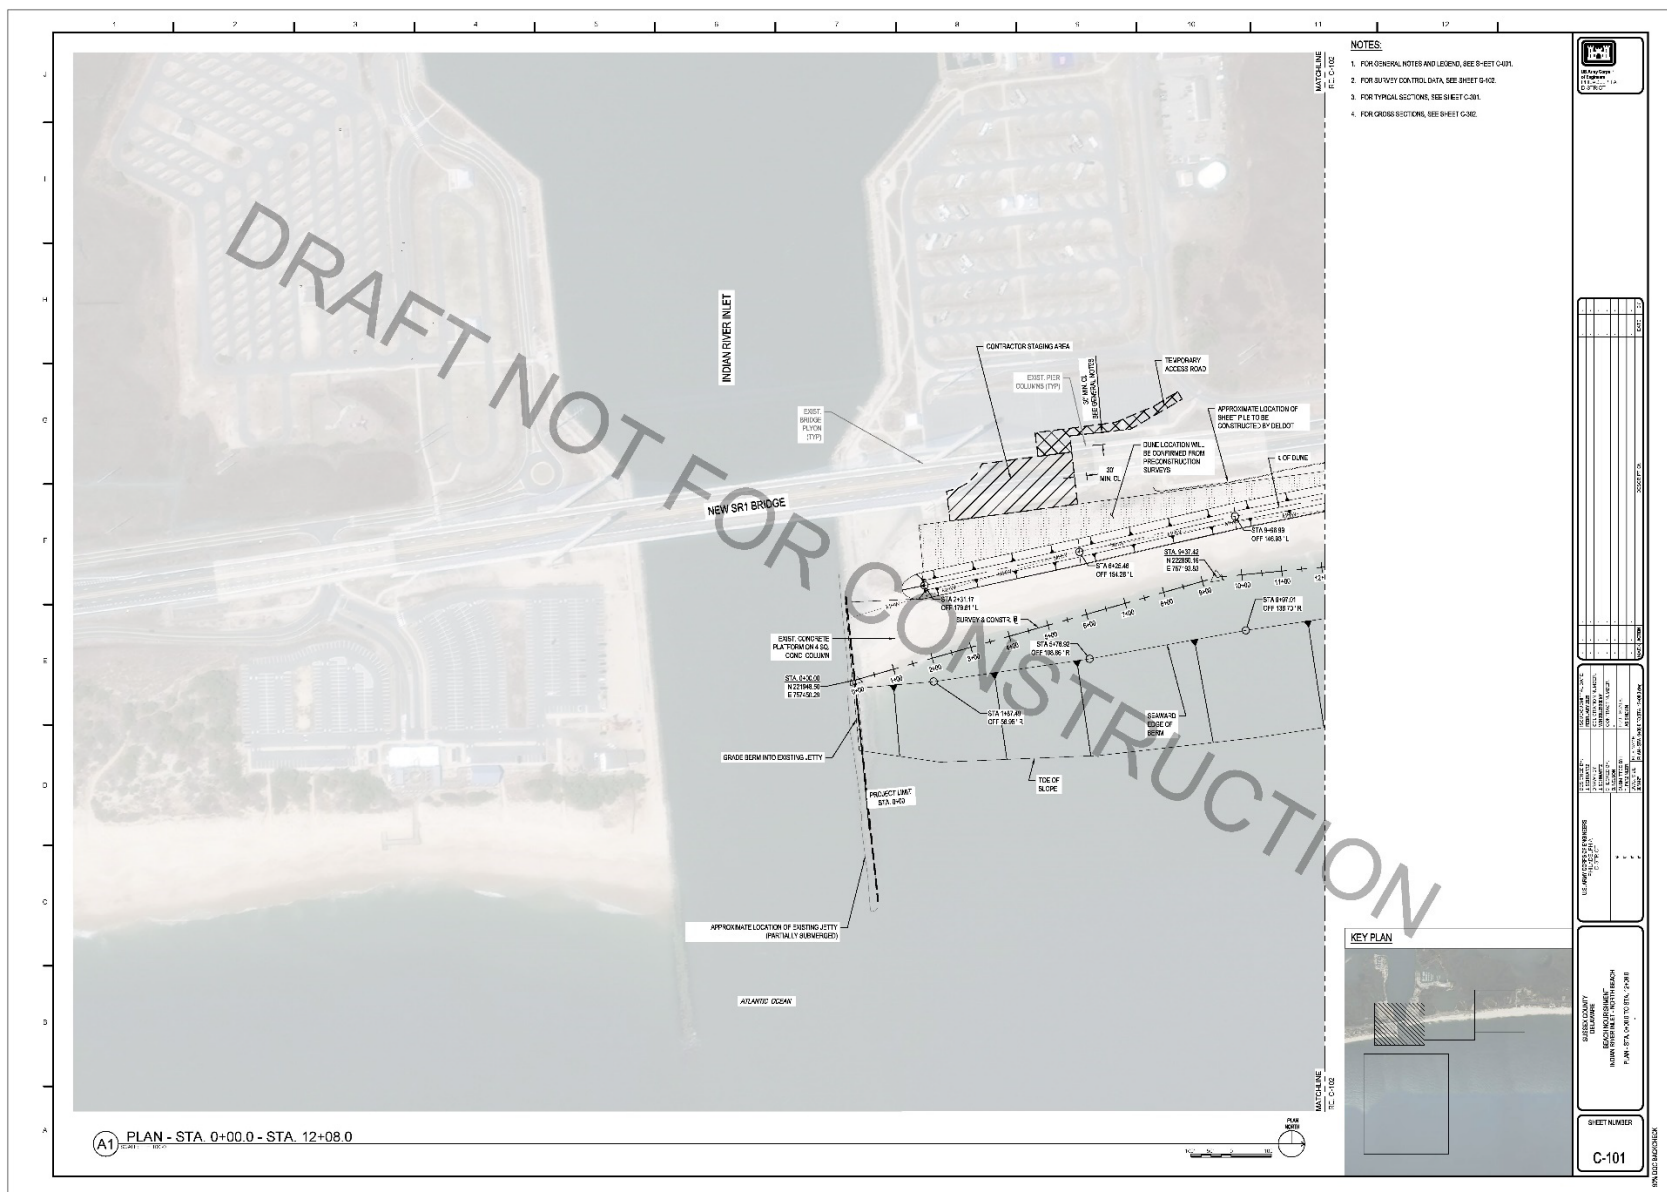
Indian River Inlet North Beach Beachfill Template and Staging and Access Areas
